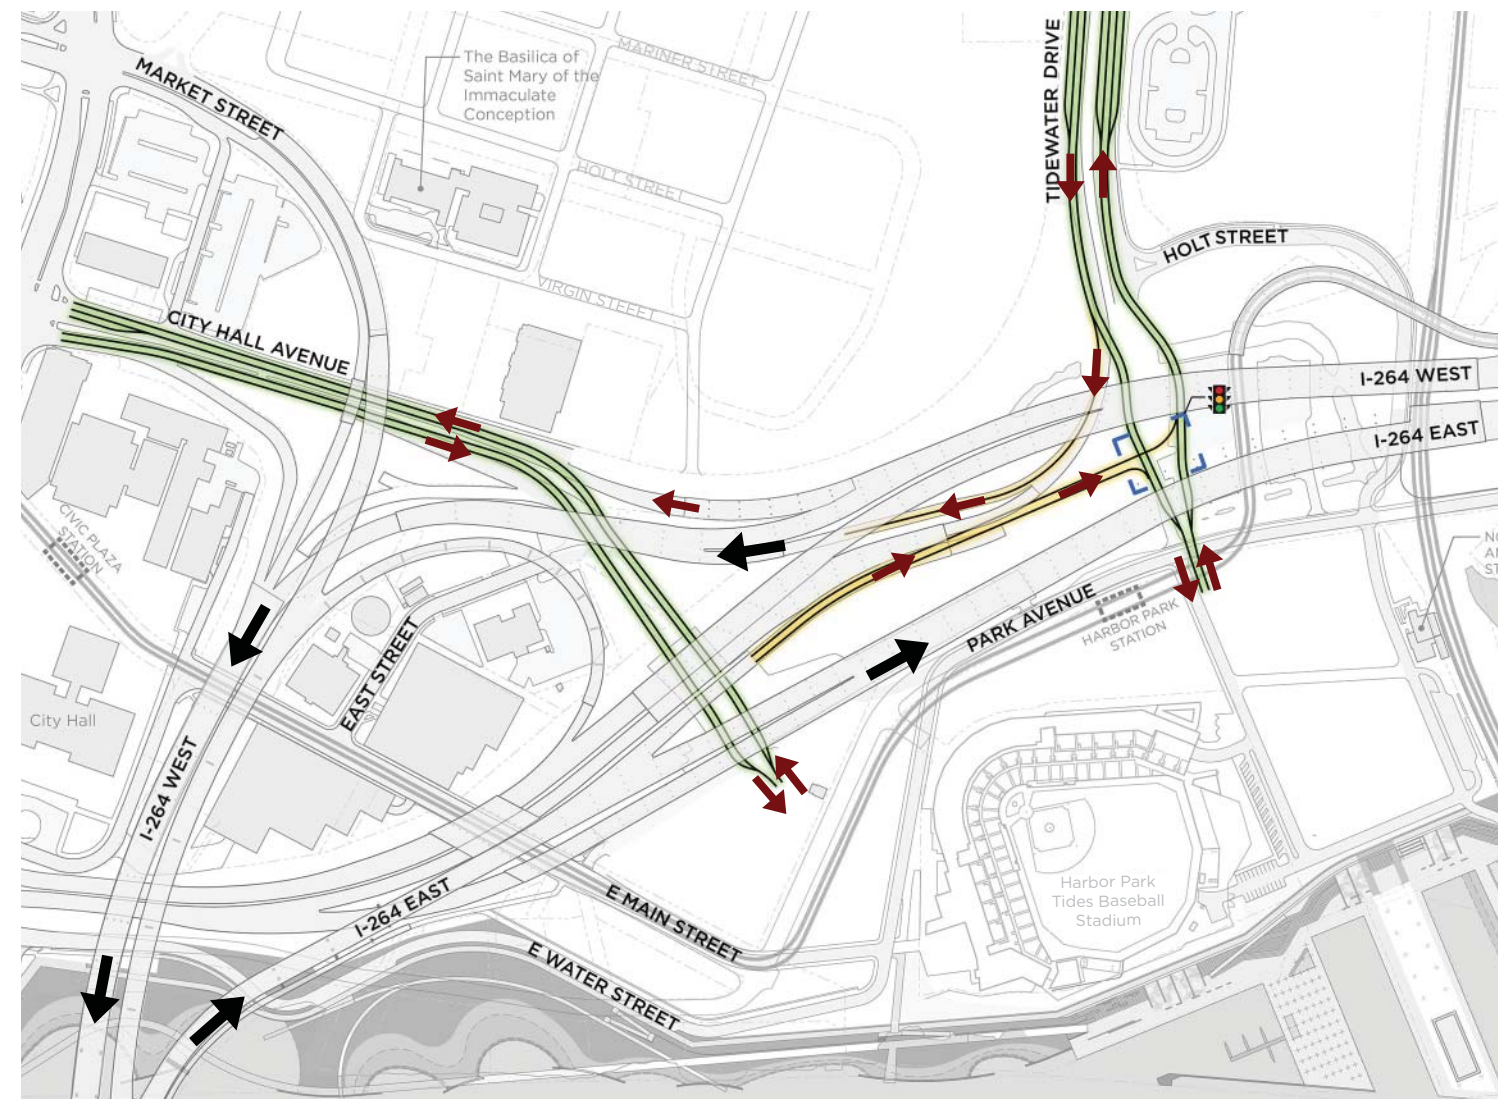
City Hall Avenue and Tidewater Drive extensions to Harbor Park.
